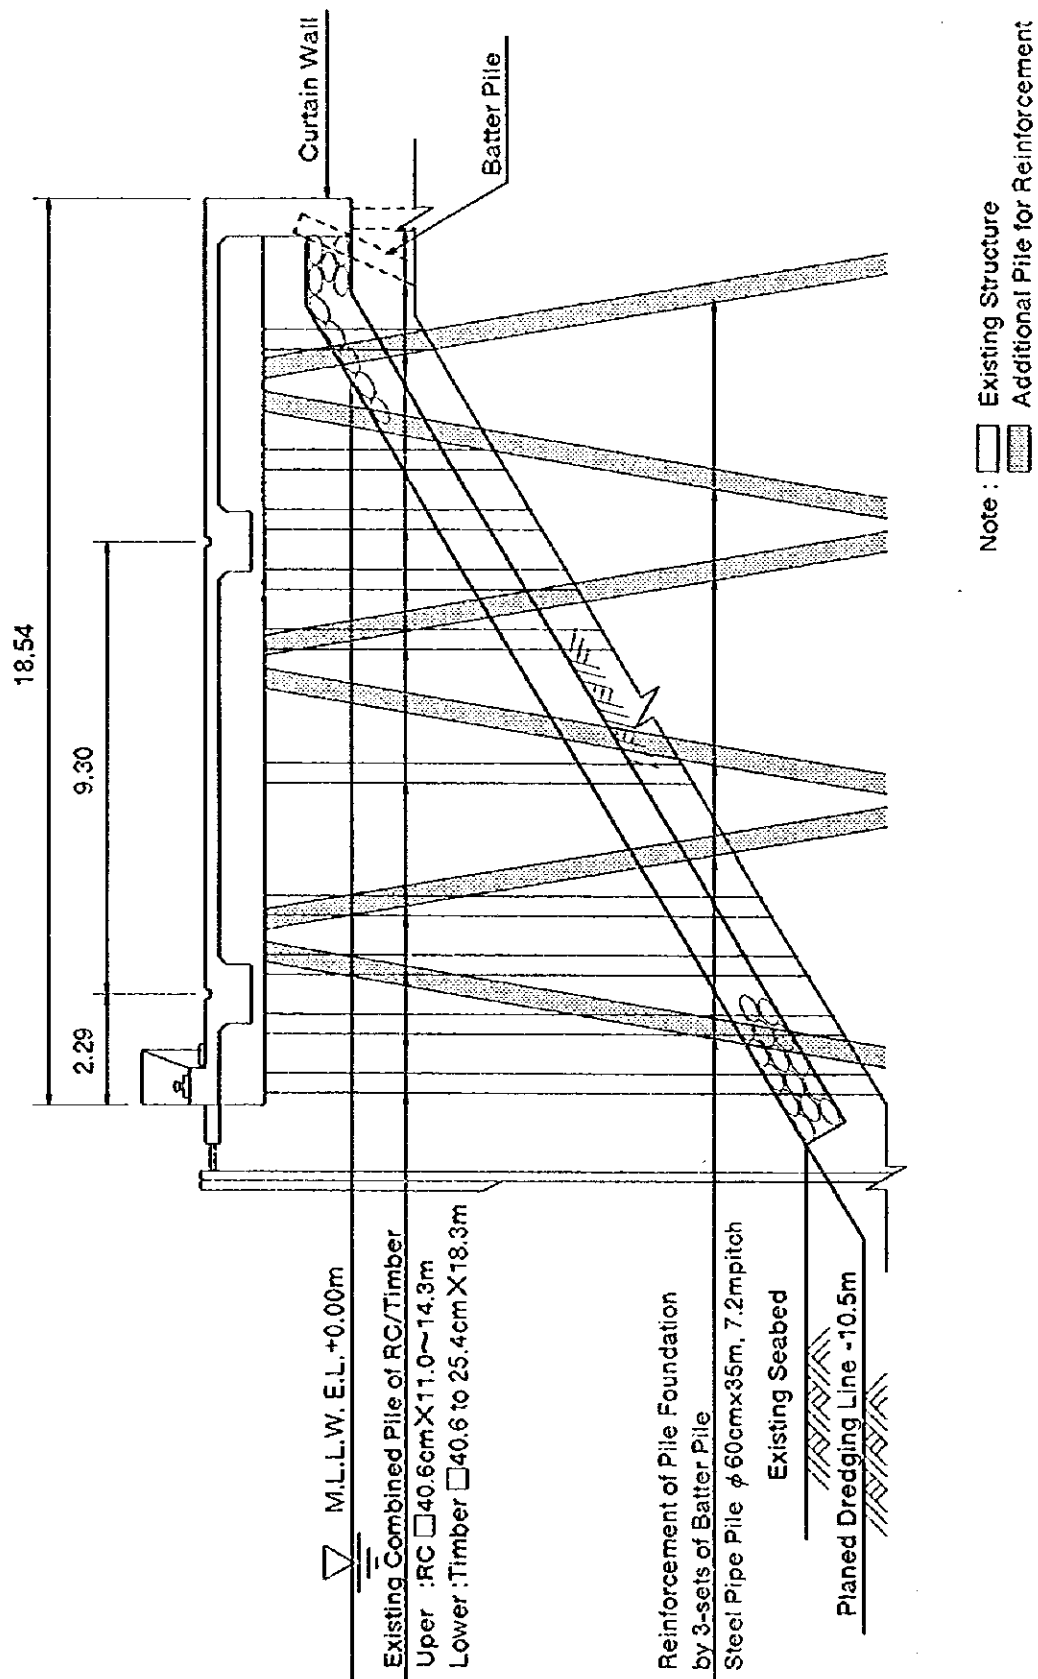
Improvement Plan, Standard Section of Rivera East
